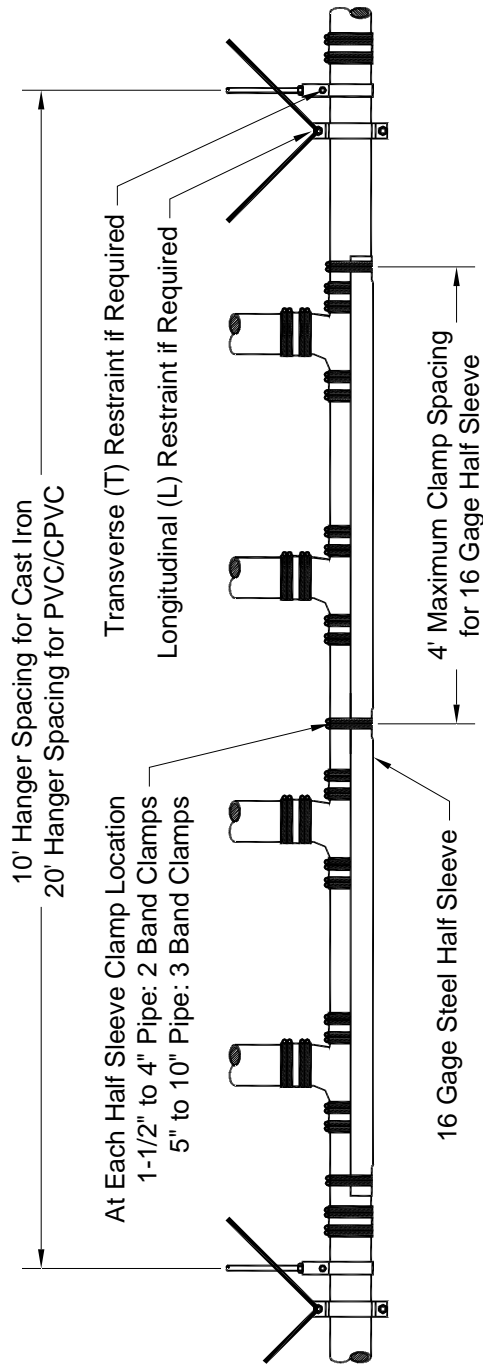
; 16 Gage Steel Half Sleeve Used to Carry Tensile Loads Across Many Fittings
